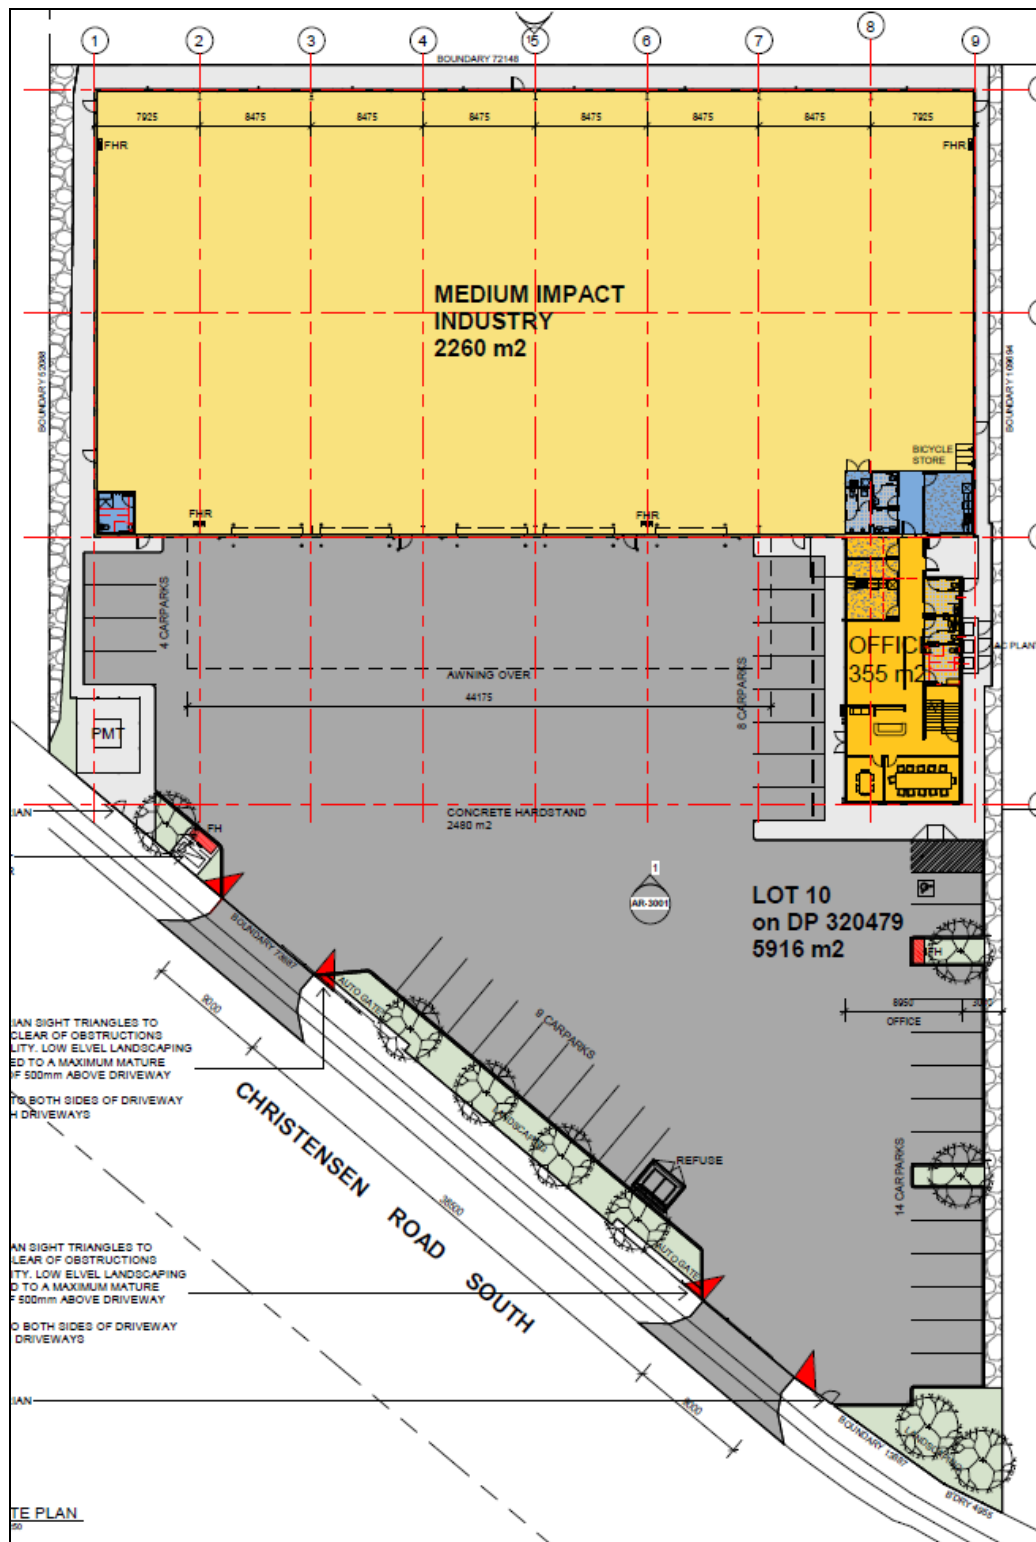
Lot 10 Site Plan (Source: Multi Span Australia Design Construct)
